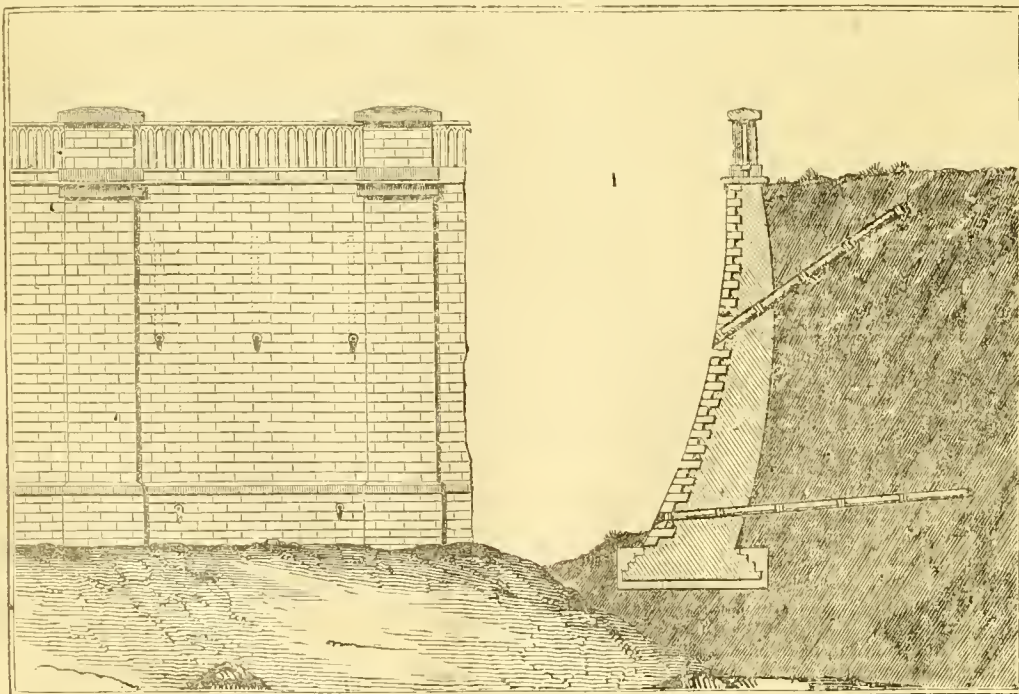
Front Elevation and Section of the Retaining Wall, London and Birmingham Railway.
